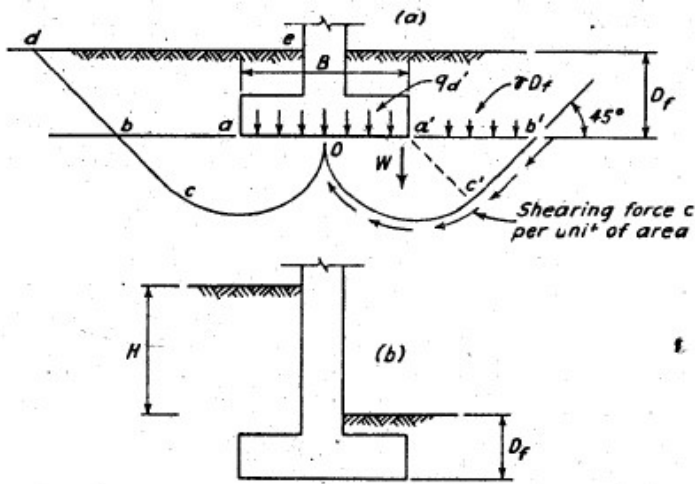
(a) Cross section through long footing on clay, showing basis for computation of ultimate bearing capacity. (b) Section showing D_f for footing with surcharge of different depth on each side.
